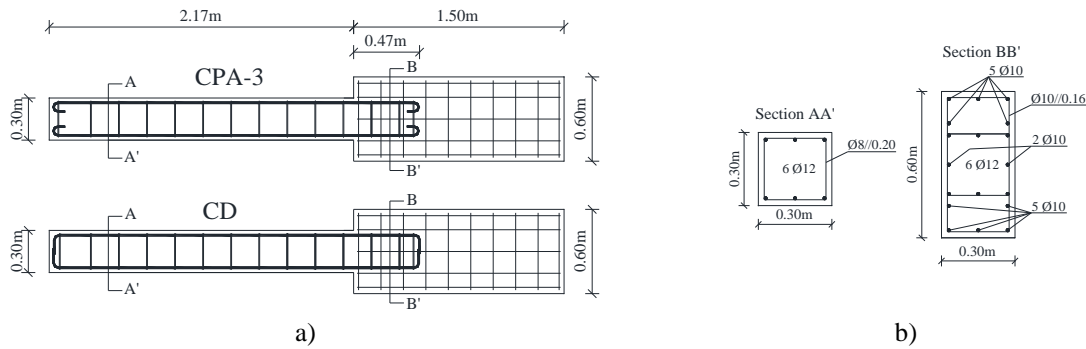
Column specimens: a) dimensions and reinforcement detailing; b) cross-sections.
